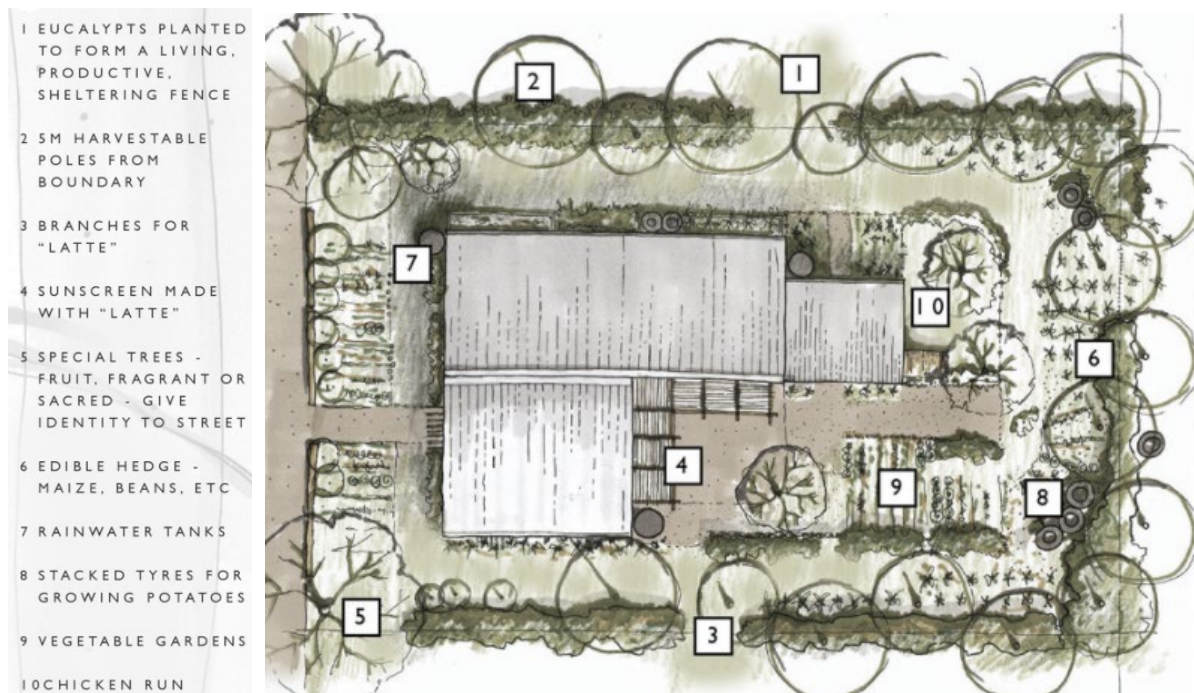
Site Plan (Holcim foundation for sustainable construction, 2008)
